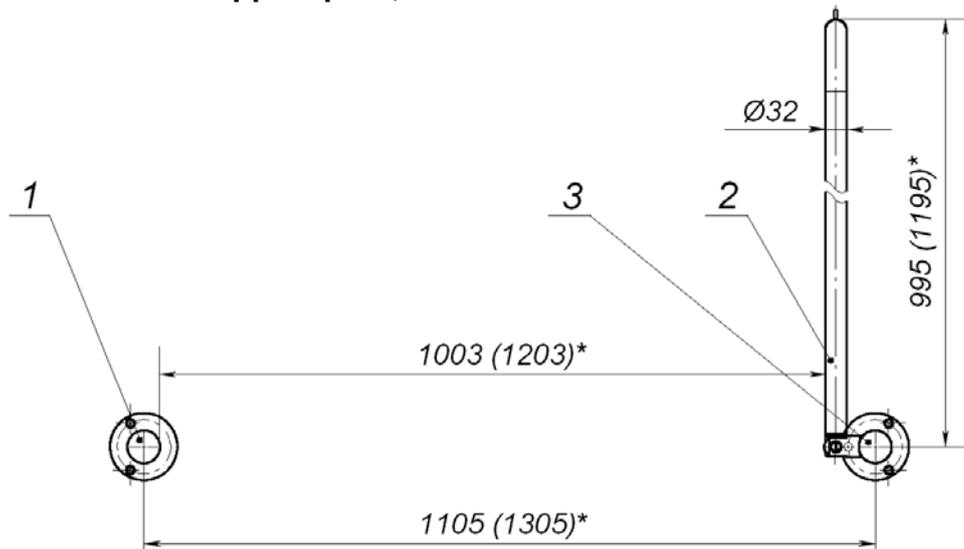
Stationary railing section without filler panel and with adjustable coupling fittings:
